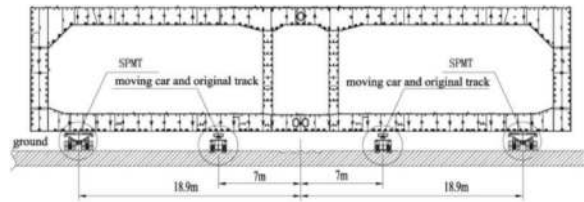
Joint transportation steel shell layout of track type hydraulic car and tire type module car (cross section).
